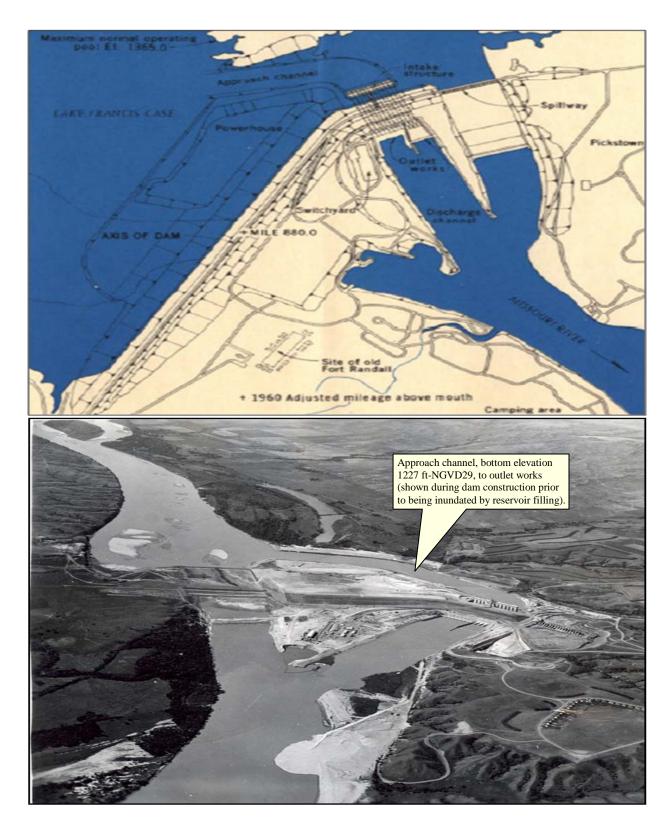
Schematic drawing and photo of outlet works at Fort Randall Dam.
